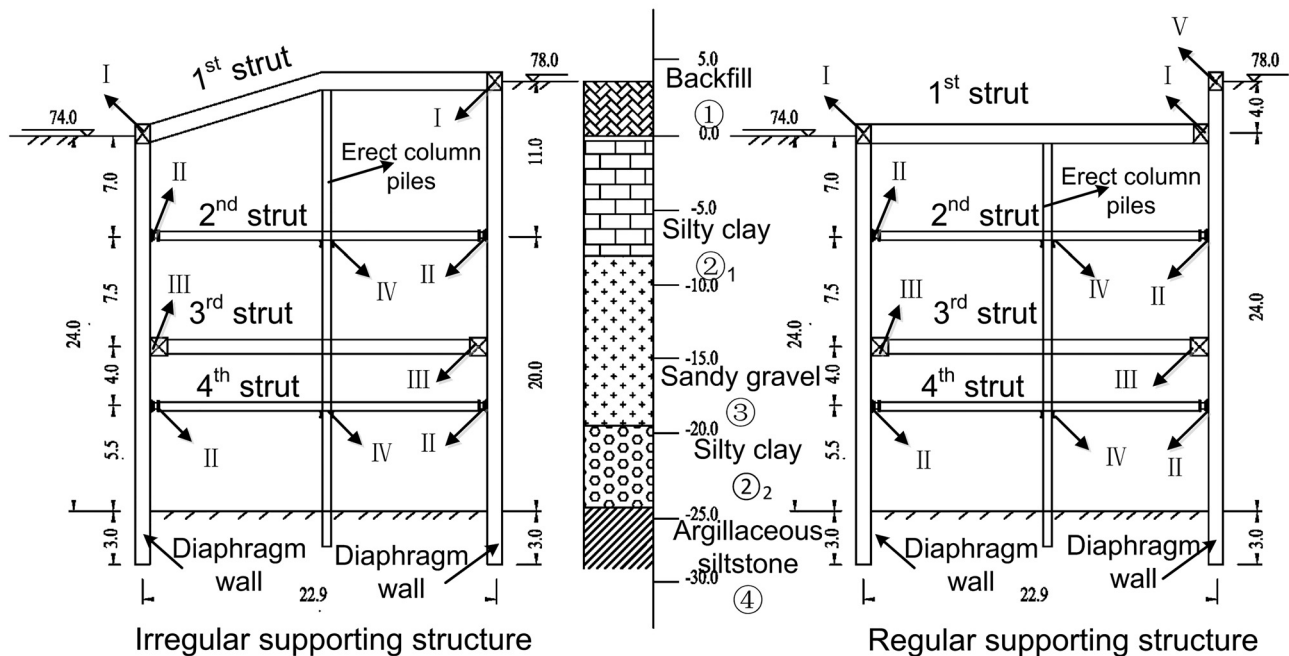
Cross section of options for the supporting scheme (unit: m).
